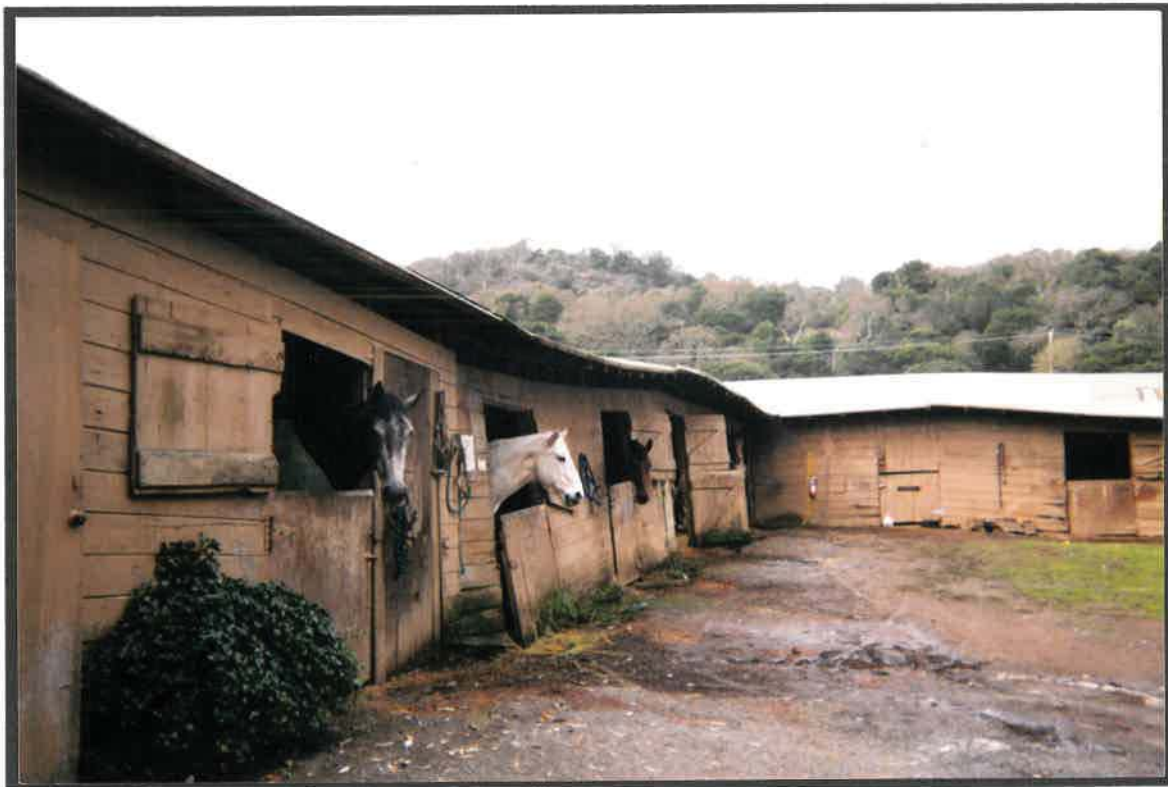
The Barn, like the rest of the property, had received little attention. Foundations were collapsing and support timbers either were rotted or eaten by horses or insects.
